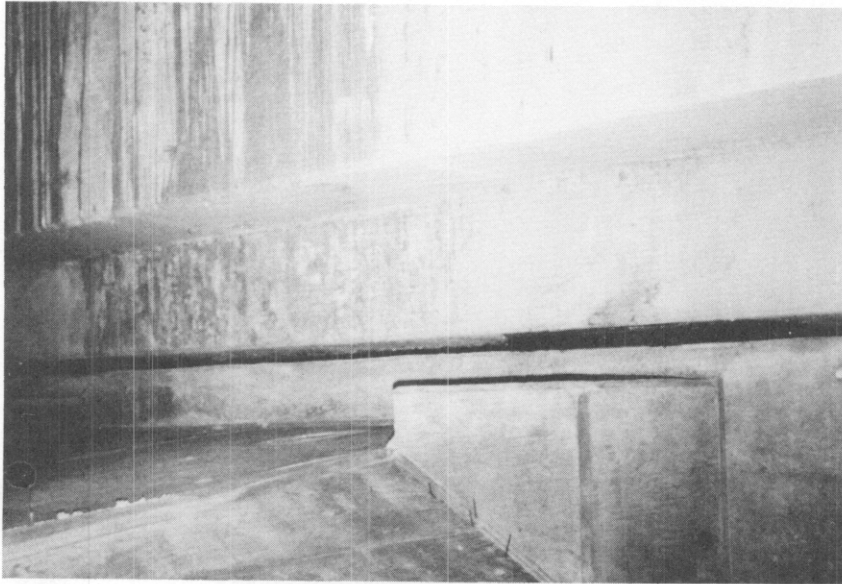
Jacking Pad for Jackable Abutment on Columbia River Bridge
